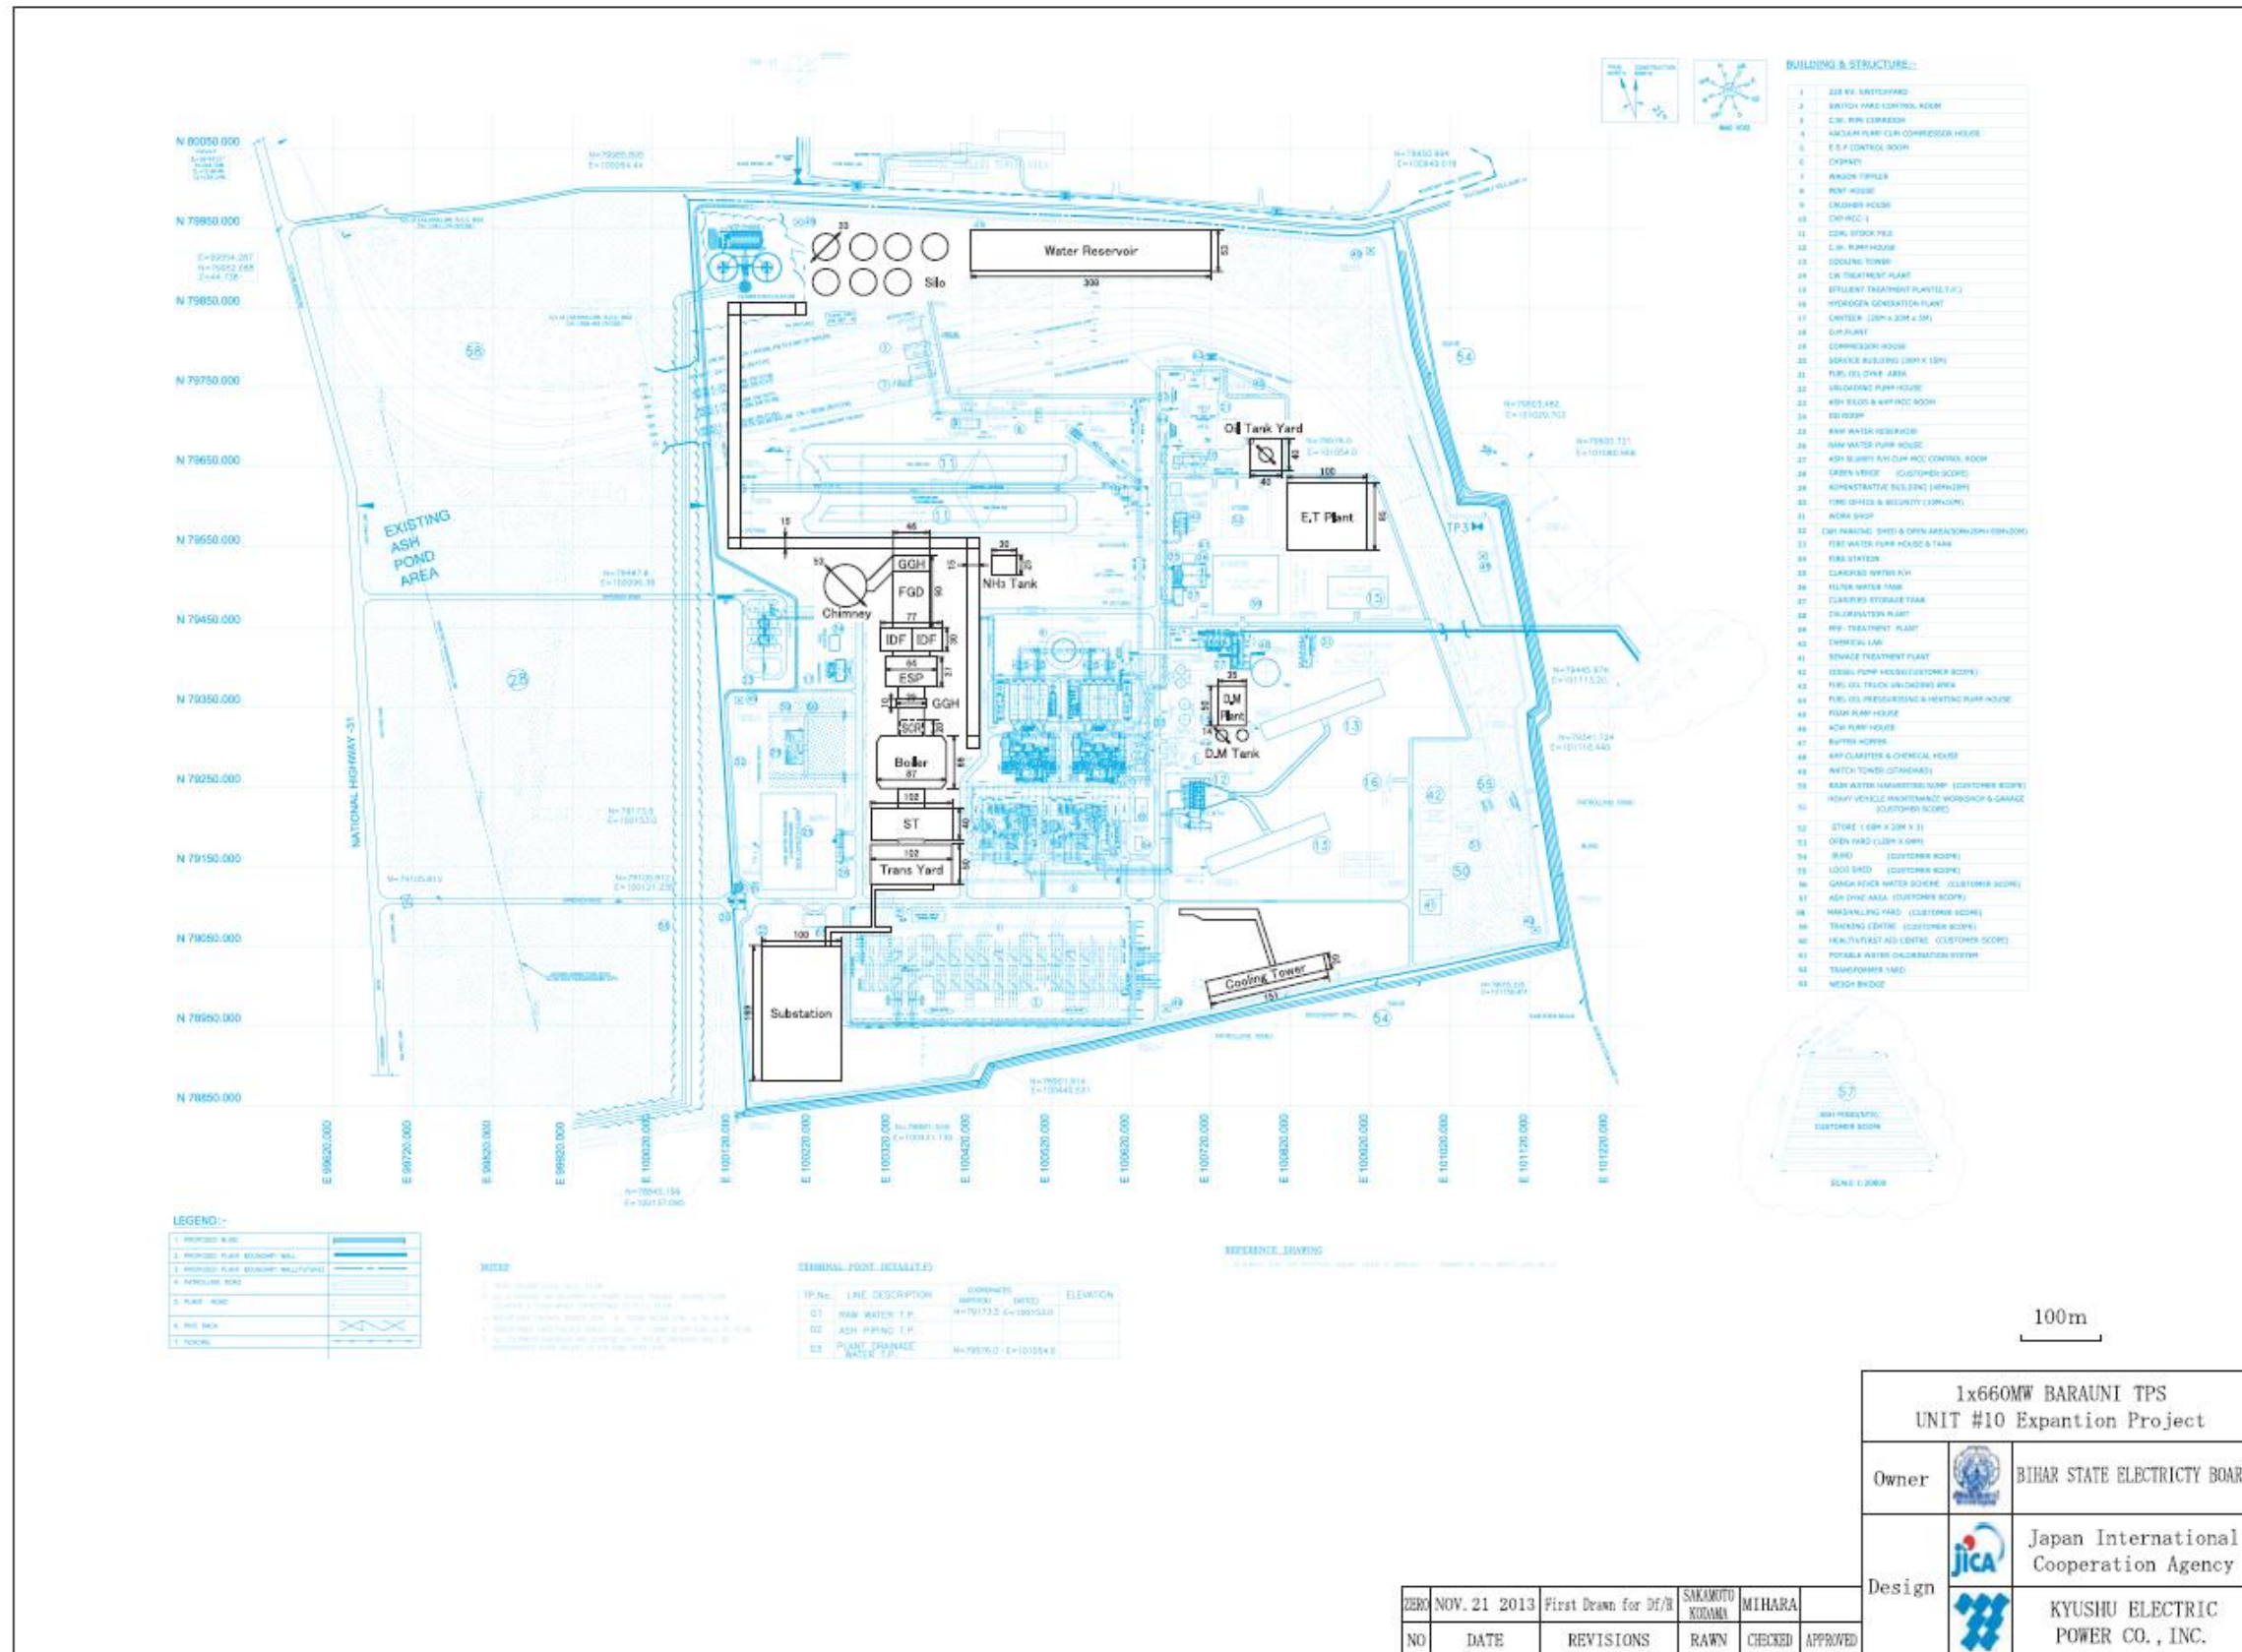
Configuration Adopted in Japan in Planned Site of Unit No.10 (CONSTRUCTION POSSIBLE)
